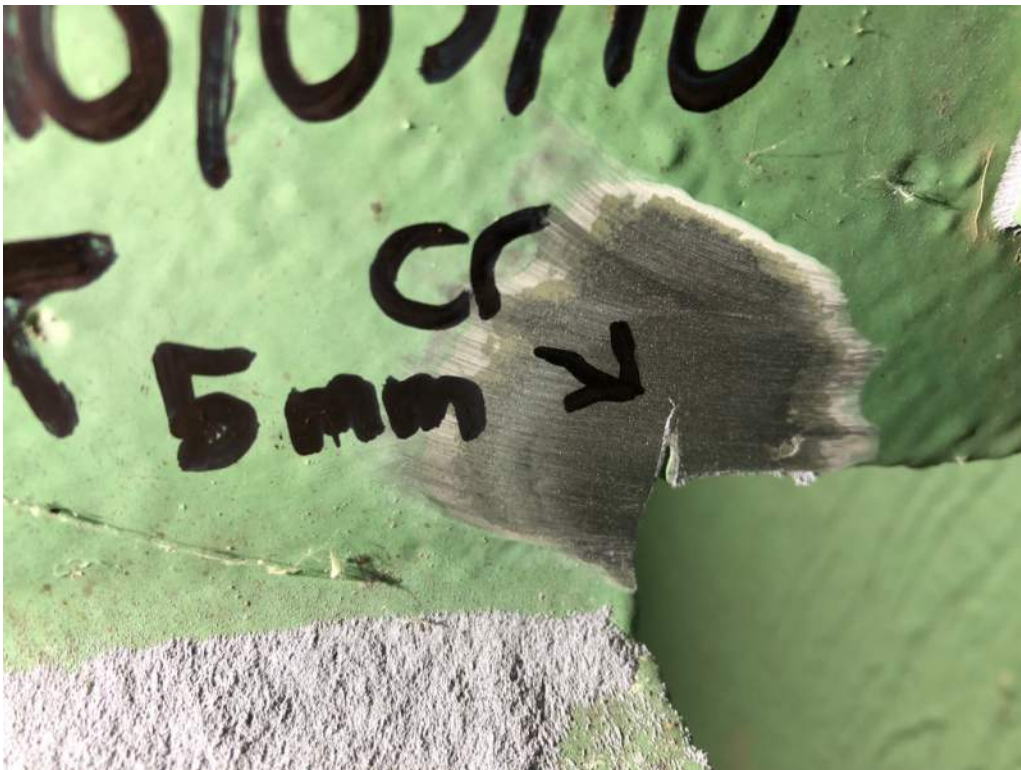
5mm notch/crack in the bottom cope of Stringer I (FB14-FB16) at FB14 (photo by Brouco NDT).
